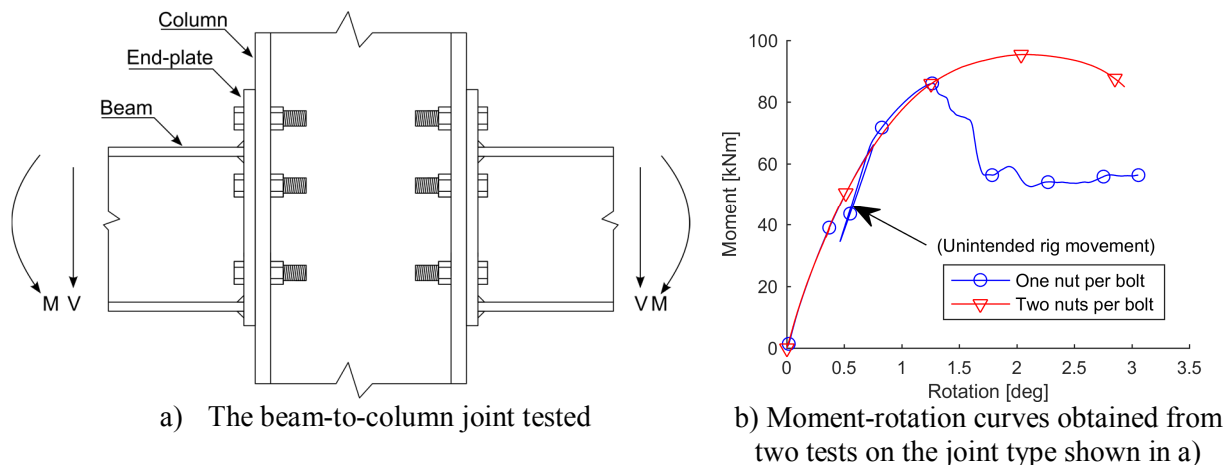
Grismo et al. [10] tested beam-to-column joints with one and two nuts per bolt.
